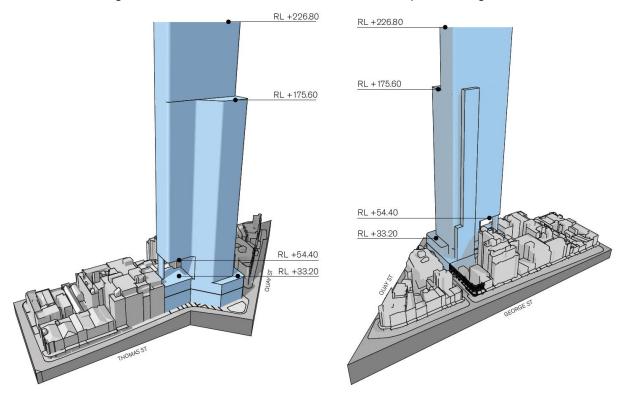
XX 187 Thomas Street, Haymarket – Elevation of indicative envelope
